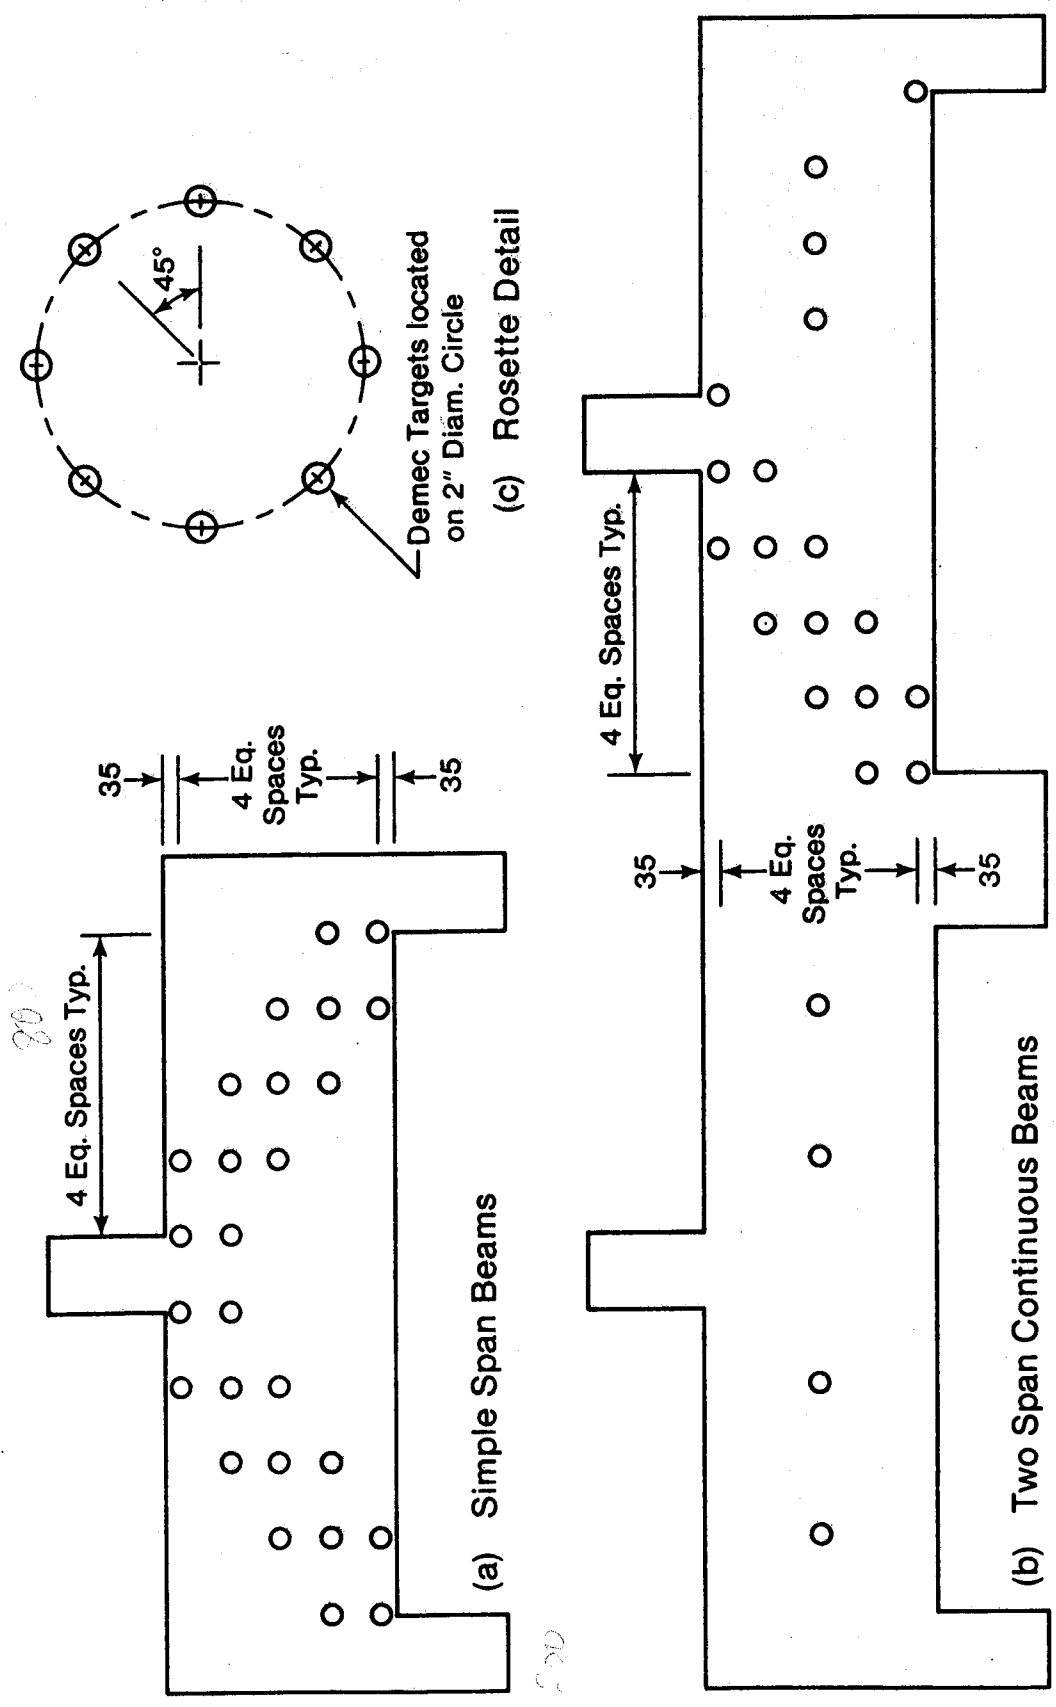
Typical Concrete Strain Gage Layout. (Seen looking through the beam from the West Face).
